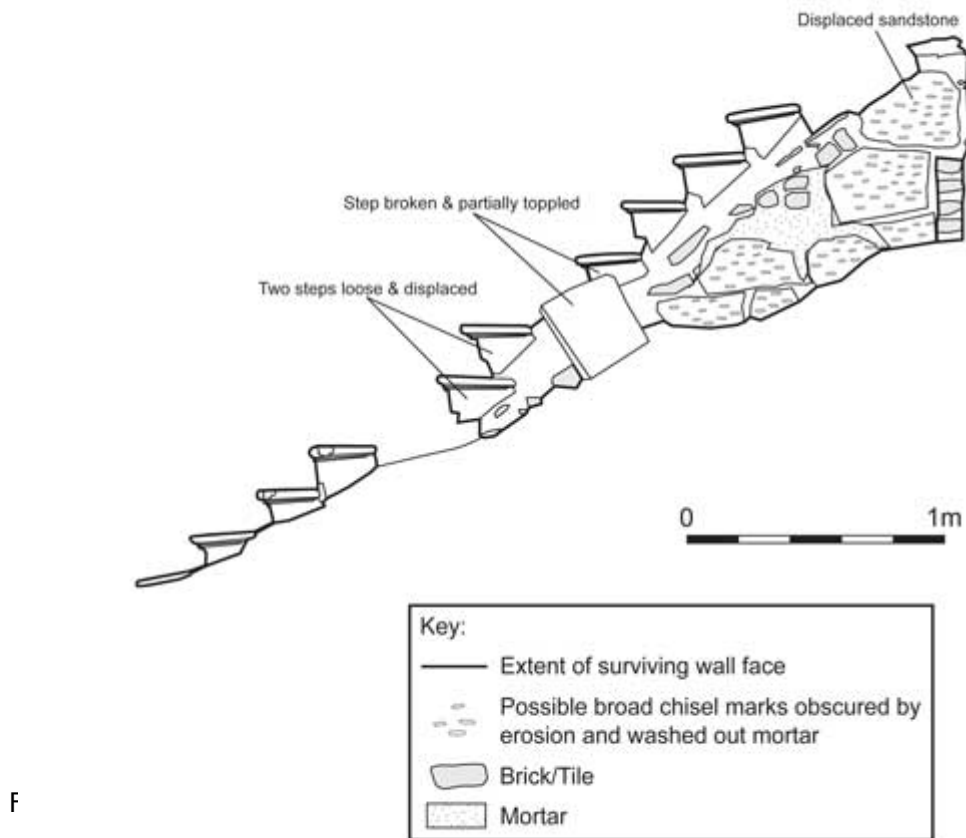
Structure 1, West Stair: Elevation e (South-facing revetment)
